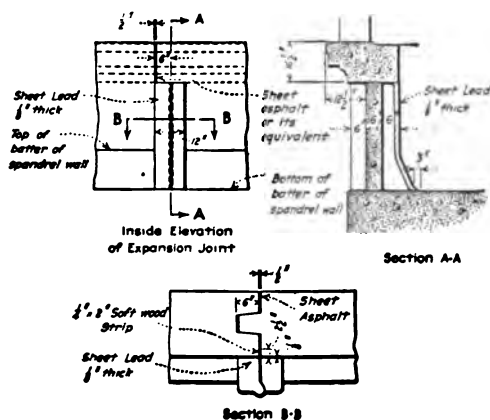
Details of expansion joint in highway arch bridge over Chattahoochee River at Columbus, Georgia.
